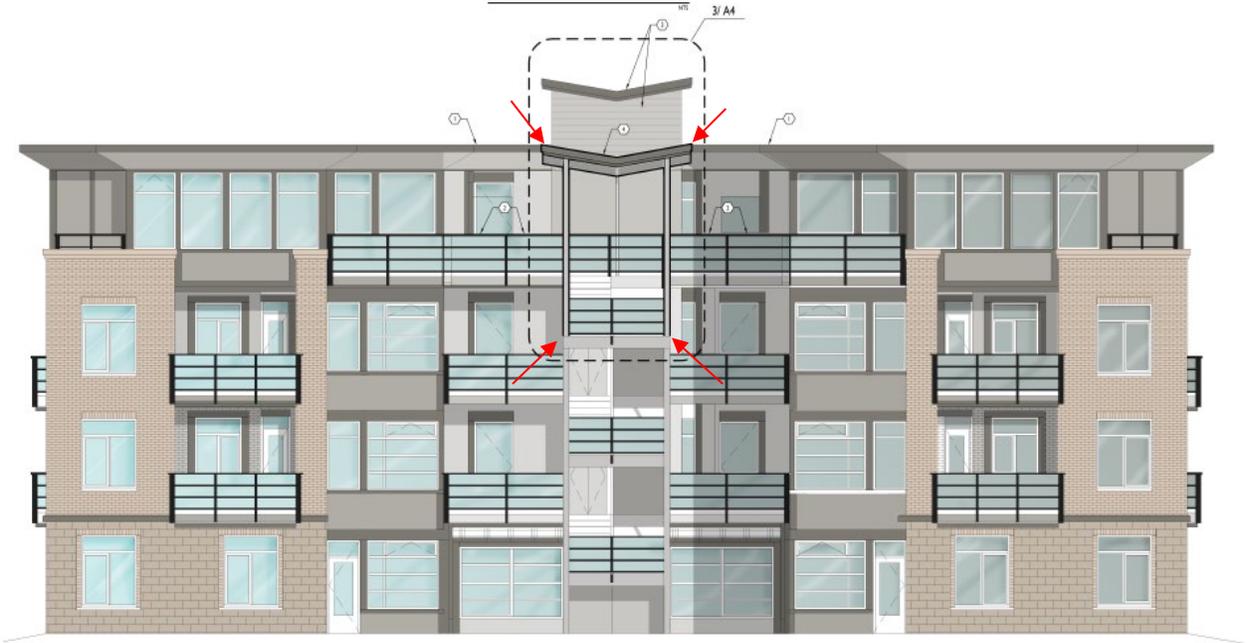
Proposed roof over stairway for 5692 Kings Road, Area D (red arrows not on plans).
